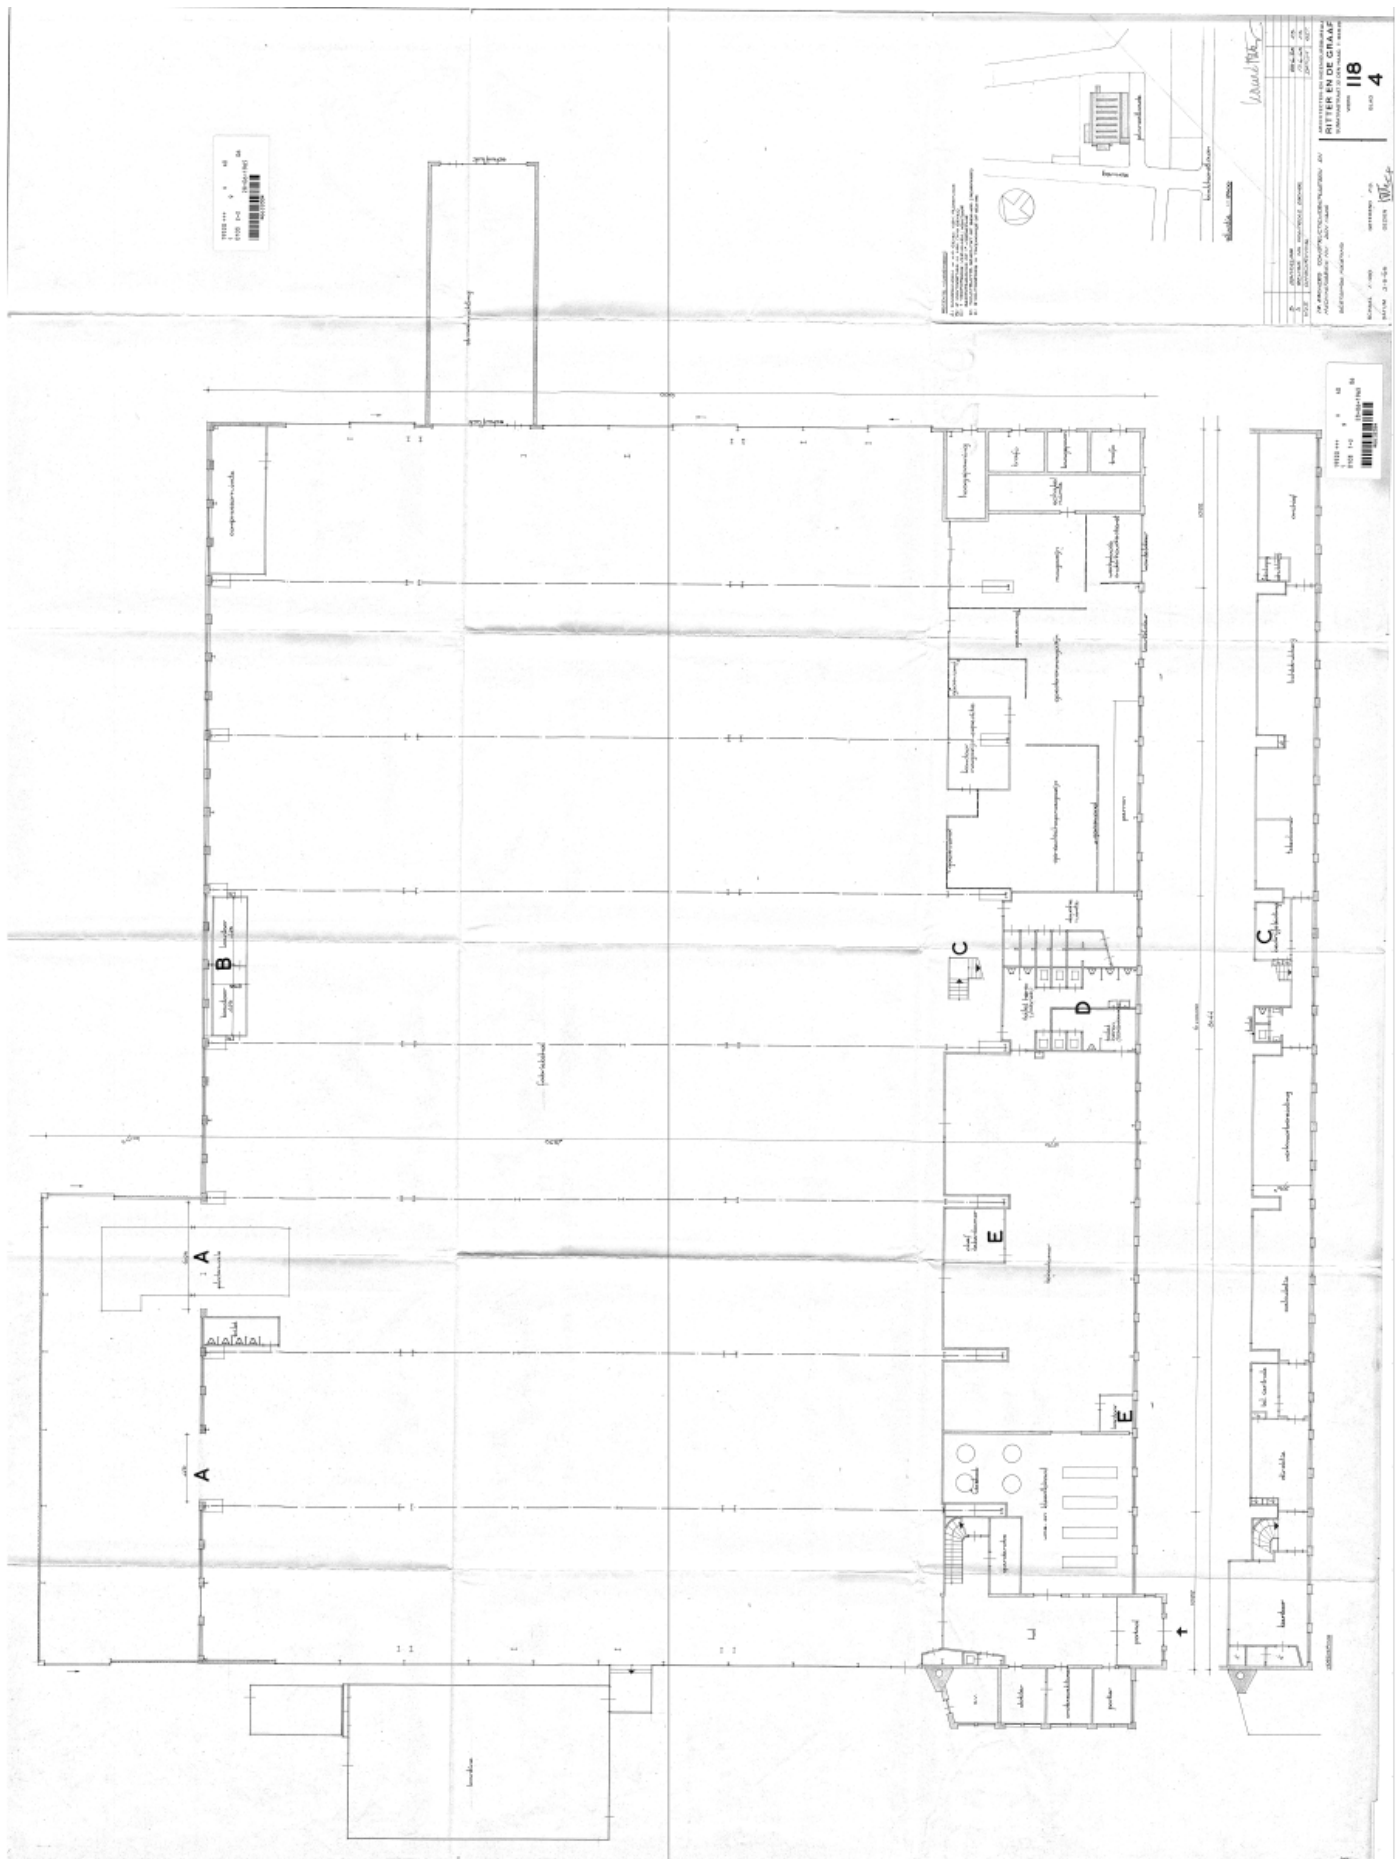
Escher Hall plan scan from Construction Drawings Archive of The Hague
